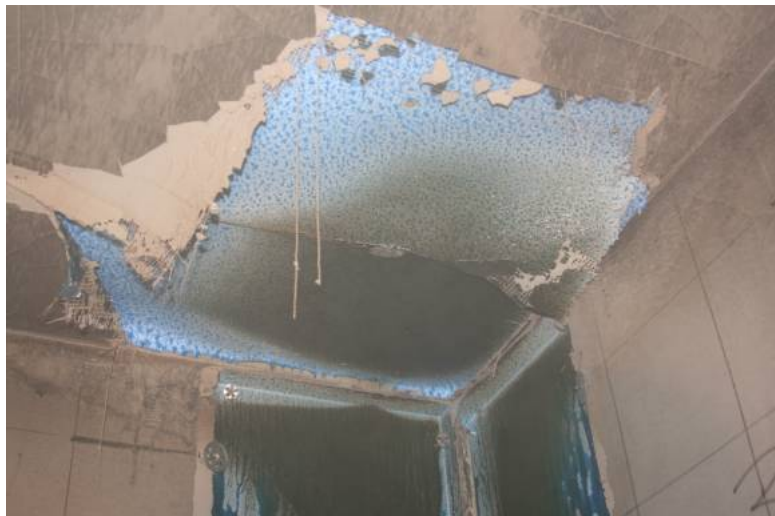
Post-Test View of Burn Corner Ceiling with Foam Exposed.
